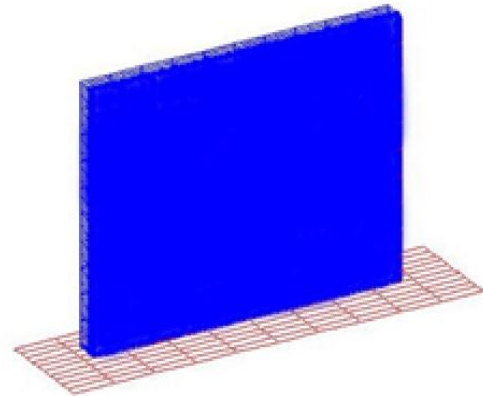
Loading diagram of CFRP two-way Hollow core shear wall without Channel shaped boundary elements
